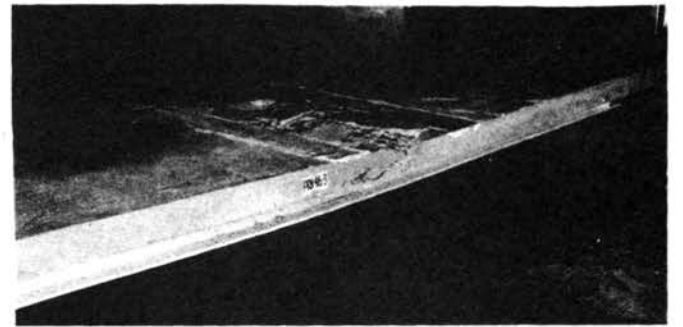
View of Beam 41b. Note the absence of herringbone type cracking in this beam. Collapse was due to flexural failure (crushing of concrete slab).
